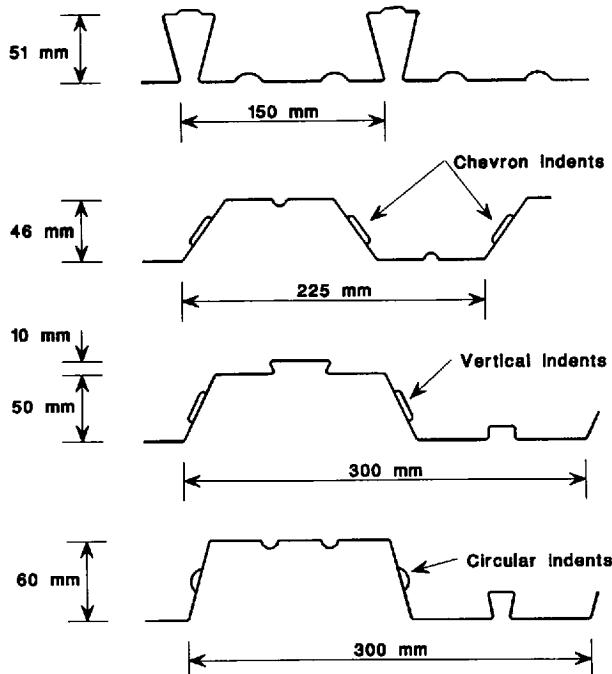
Typical re-entrant and trapezoidal deck profiles used in composite slabs. (Other profiles are available and may be used)
